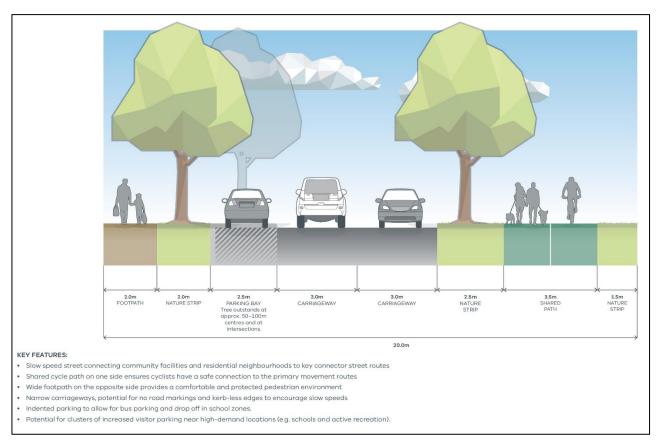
Local access – Devon shareway cross section - 20m (Source: VPA)
